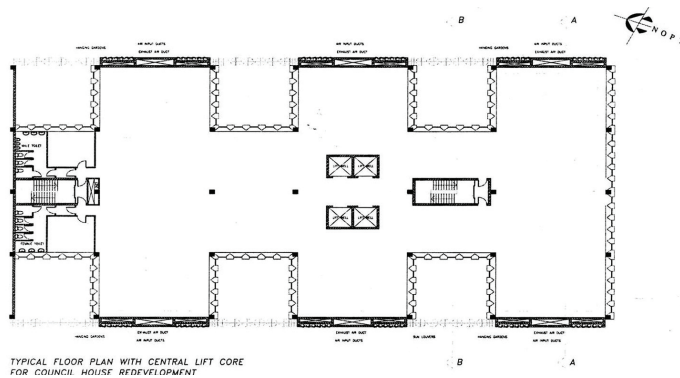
Building Development: The Shallow Space Concepts with Internal Bays
